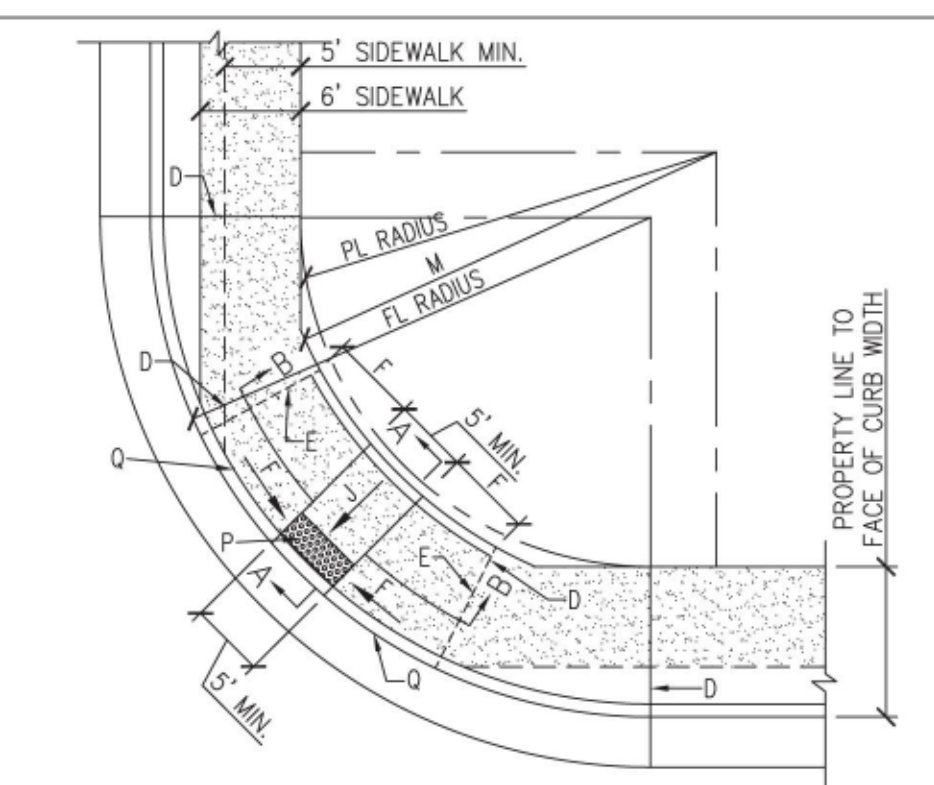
DETAIL A MINIMAL R.O.W. FOR SIDEWALK AT BACK OF CURB PERPENDICULAR RAMP
